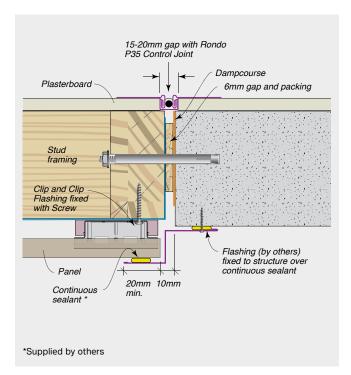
Typical Junction with Fibre Cement Cladding System – Plan View
